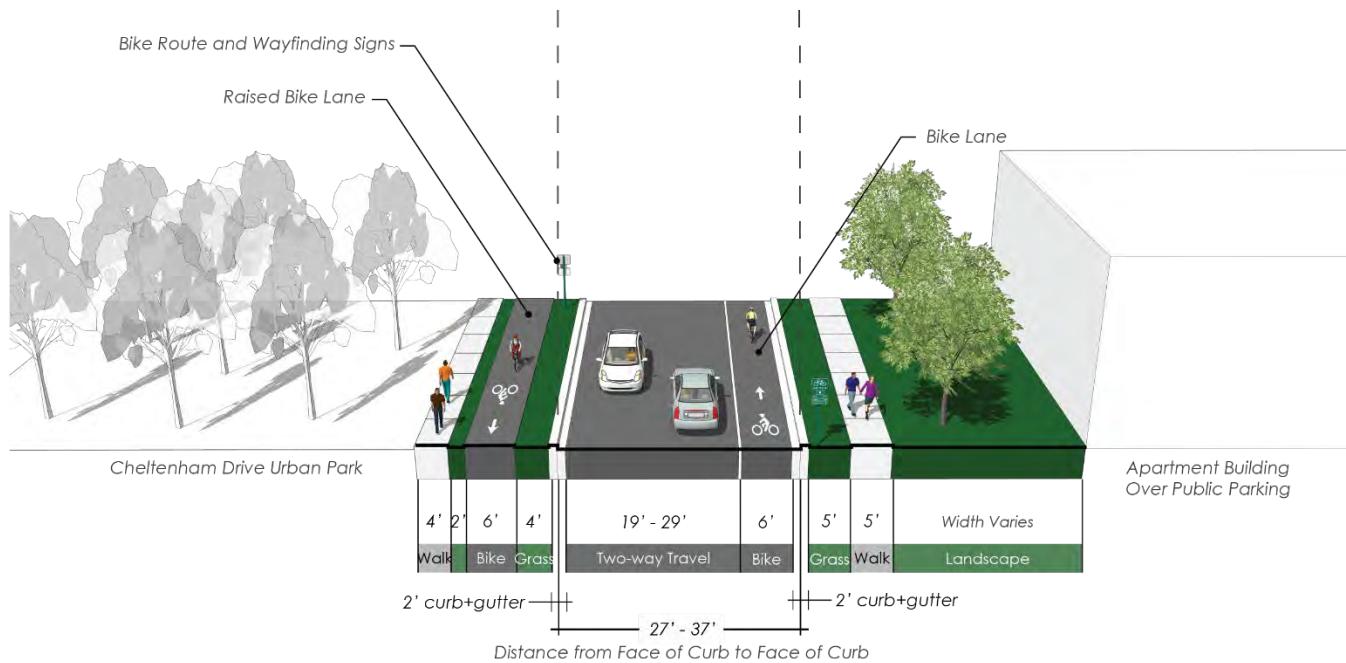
Recommended Typical Section for Cheltenham Drive (Alley to Tilbury Street)
